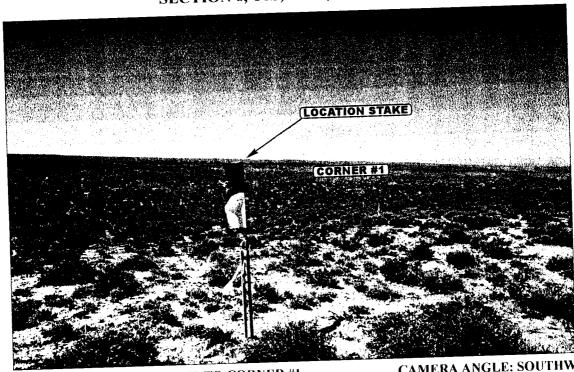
PHOTO: VIEW FROM LOCATION STAKE TO CORNER #1
